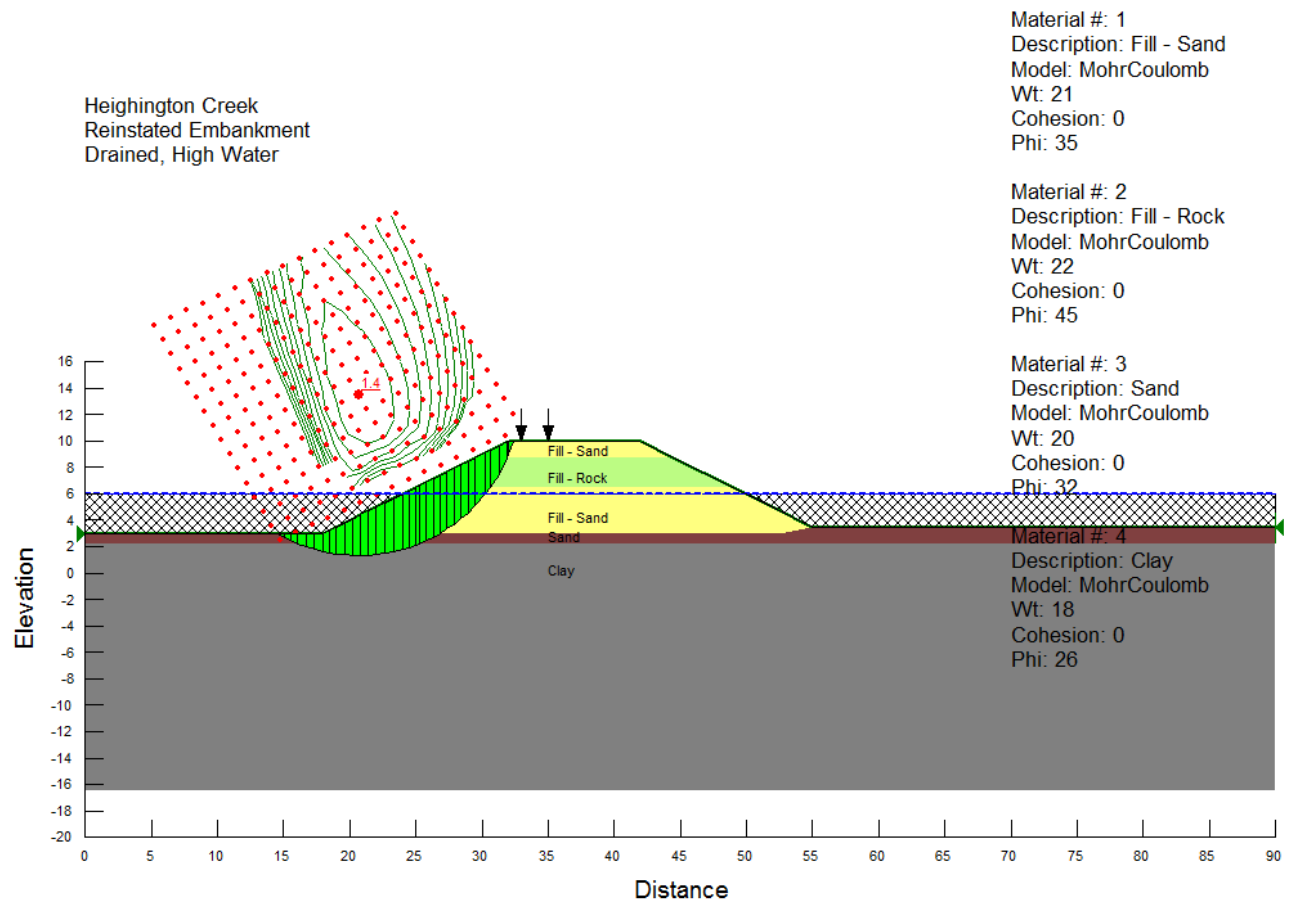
Slope stability analysis after culvert replacement left side reinstated embankment with 2H:1V foreslopes under drained condition
